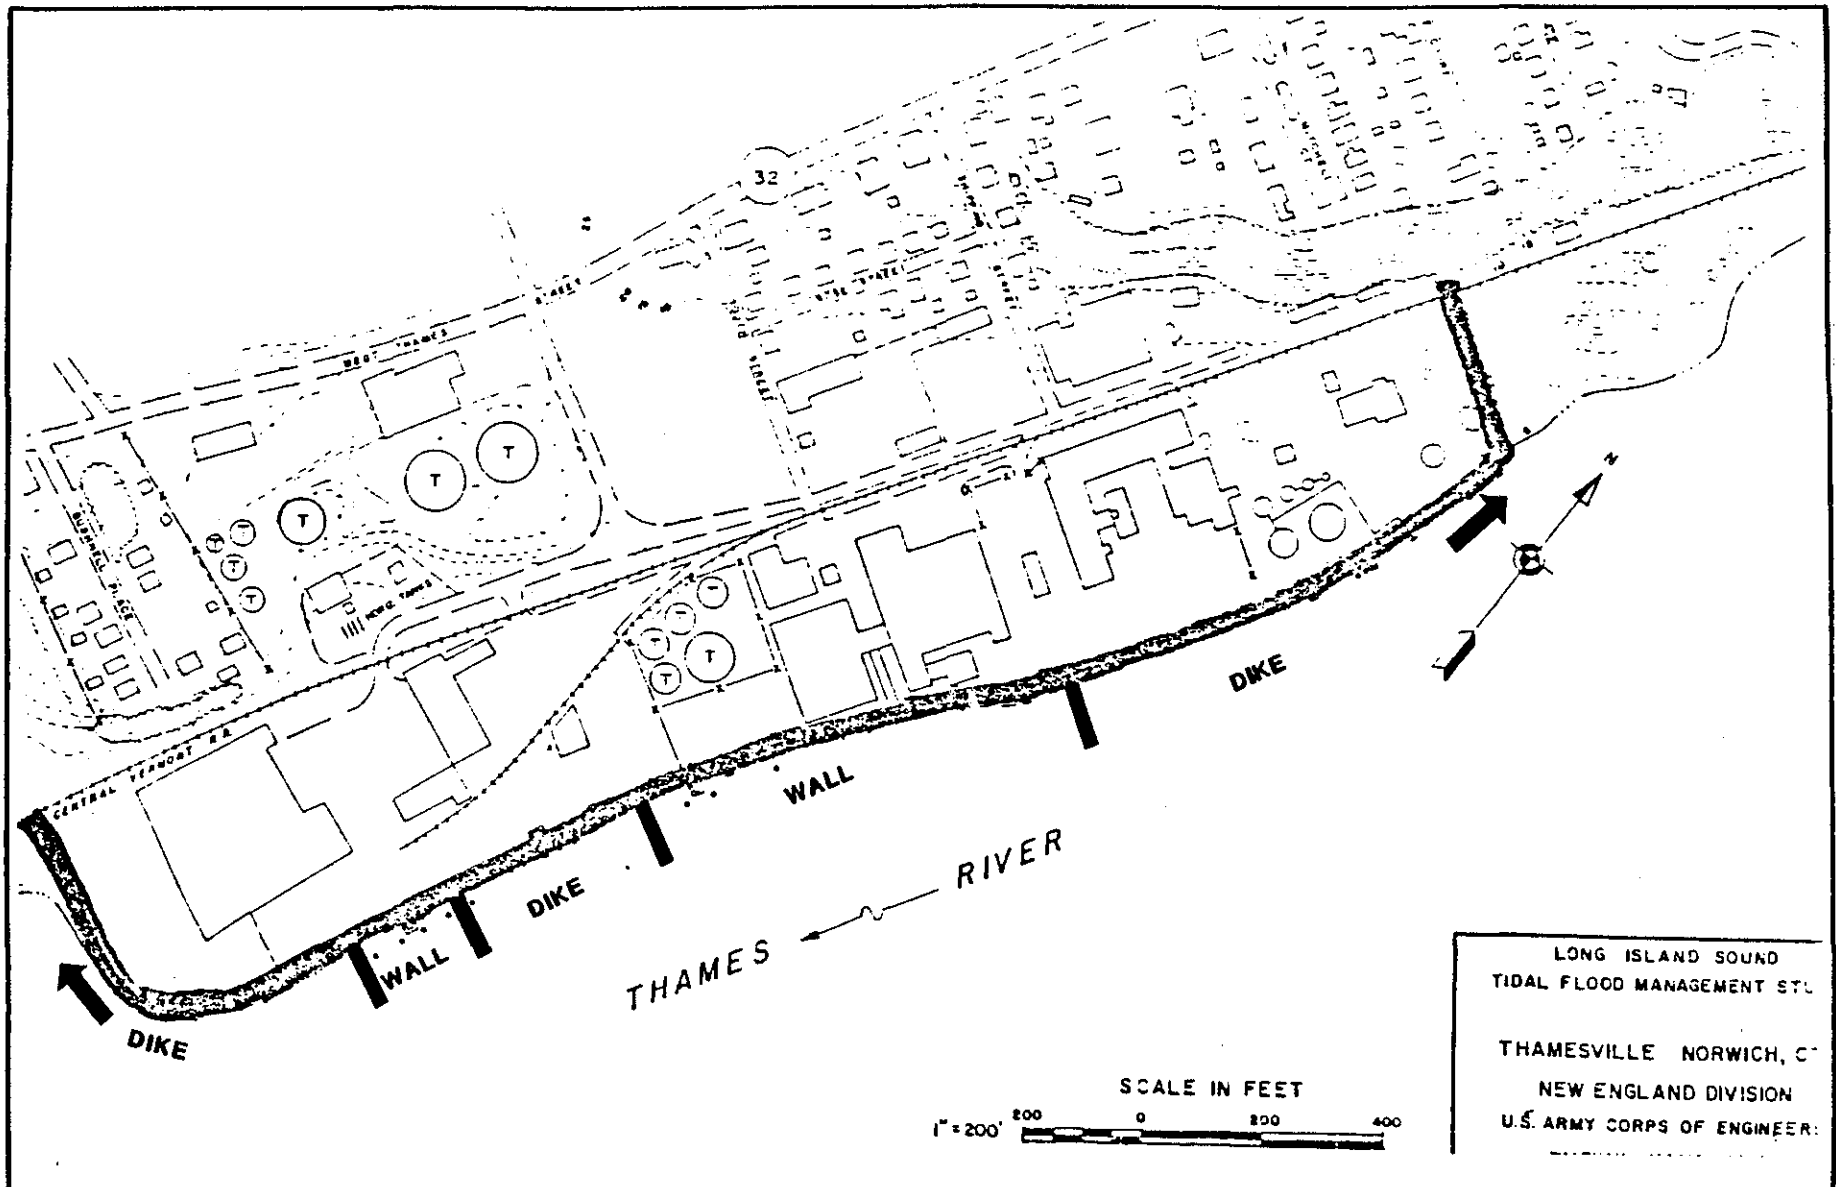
Alternative No. 2 - Dike and Floodwall Construction (Waskiewicz, 1985)
